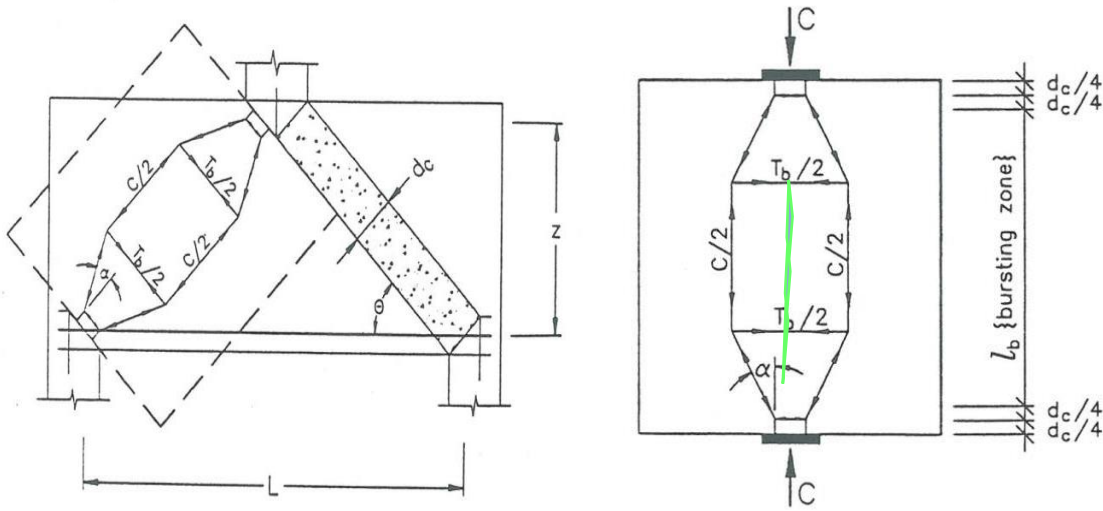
Splitting failure mechanism formed in compressive strut. (source: Foster and Gilbert [10])
